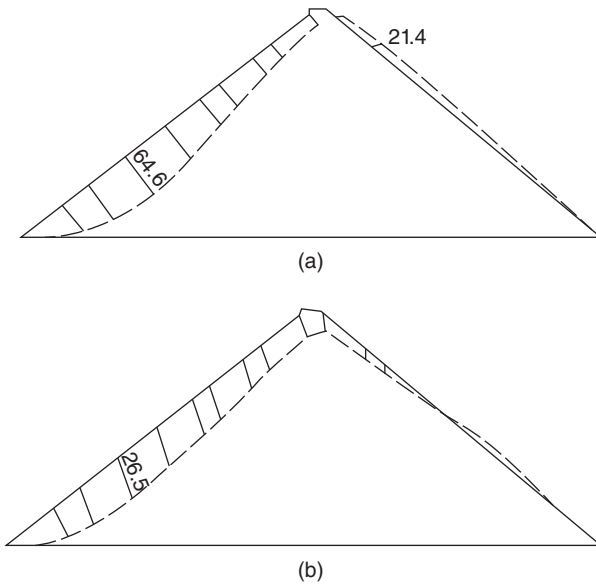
Displacement after impoundment at typical cross section of Tianshengqiao rockfill dam with concrete face slab (cm).
